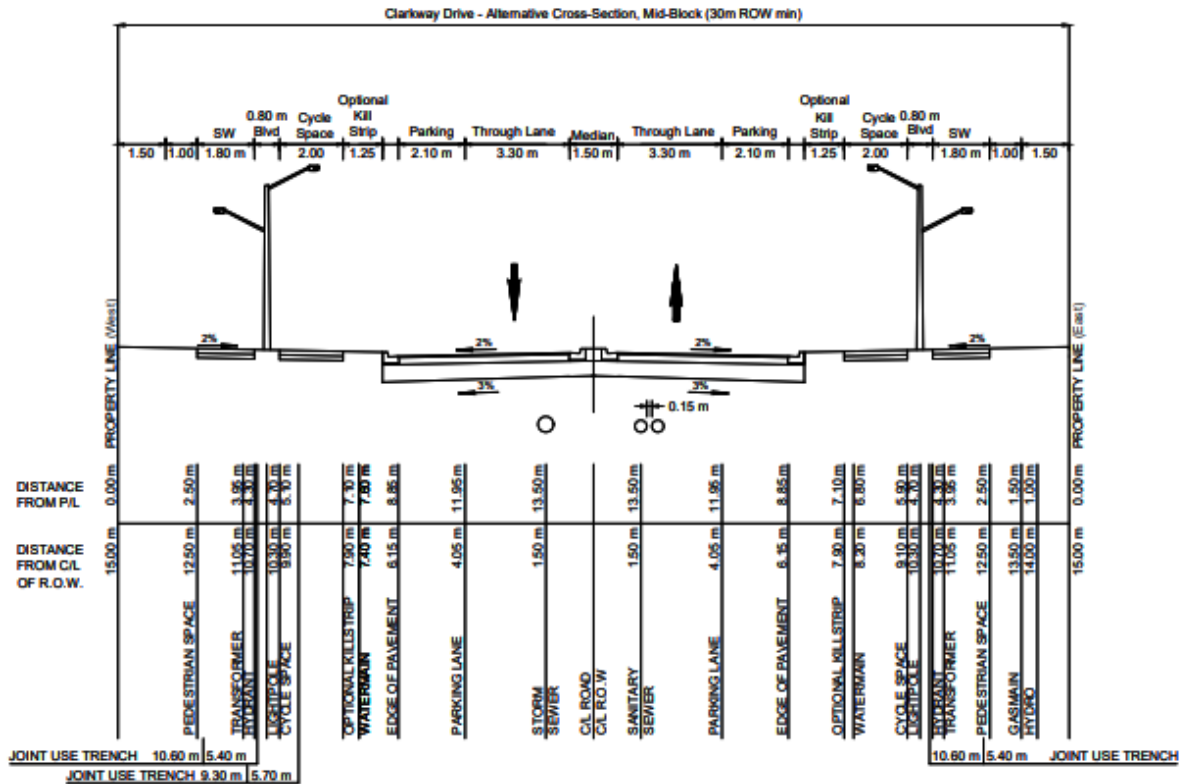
Recommended Cross-Section for Clarkway Drive: Collector Road 'C' To E-W Arterial (Option 2)
